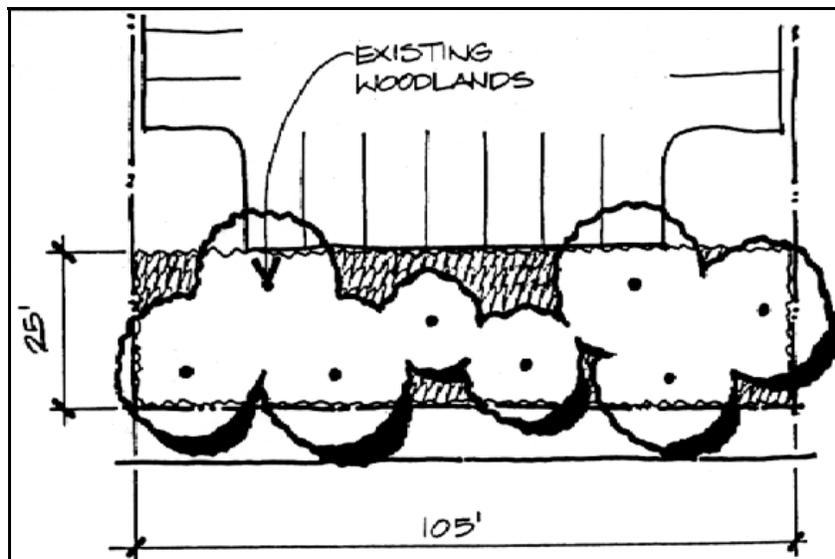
Parking Lot Landscaped Strip, Option 5
